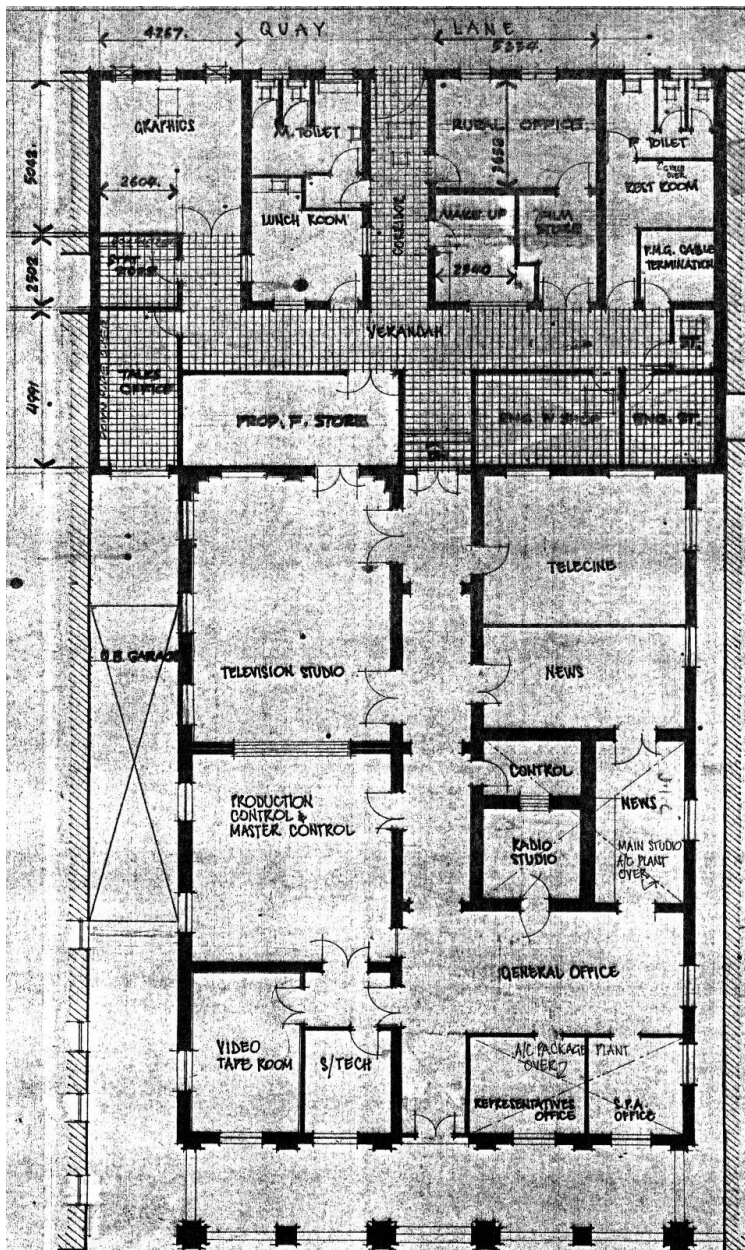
Floor plan of 236 Quay Street, Rockhampton about 1963 (Source: ABC files, National Archives of Australia)
